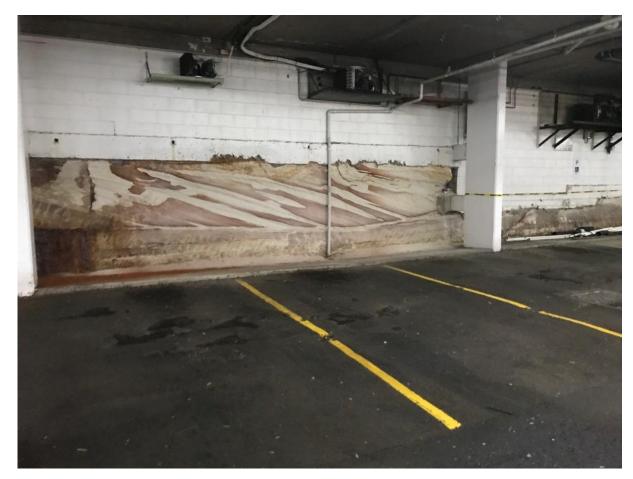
View of the sandstone rock face exposed along the northern basement wall
